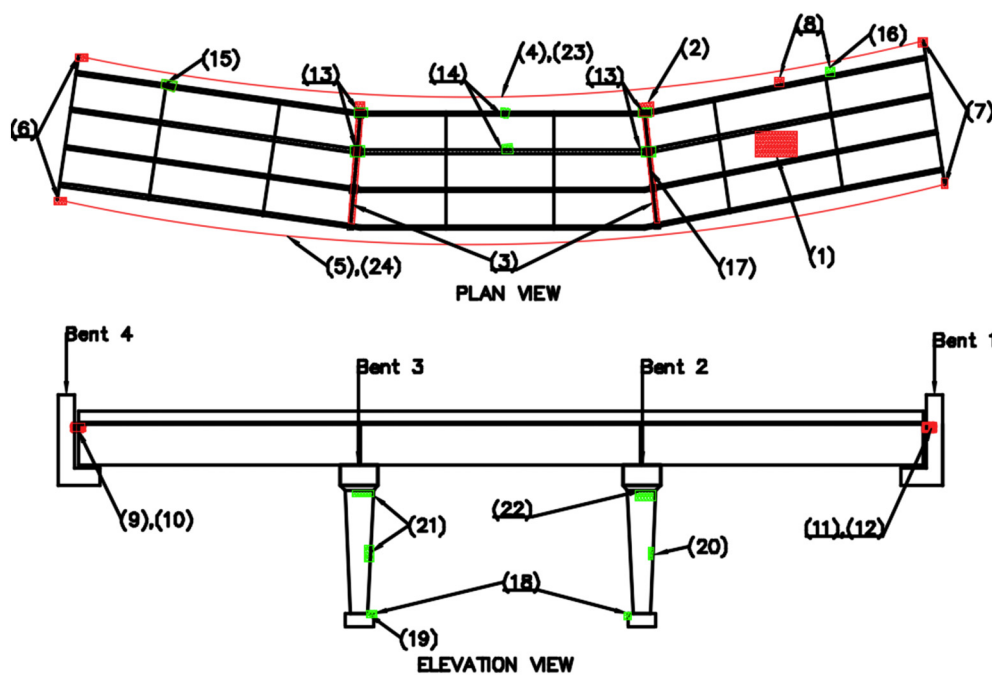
Timber girder bridge layout with identified damage.
